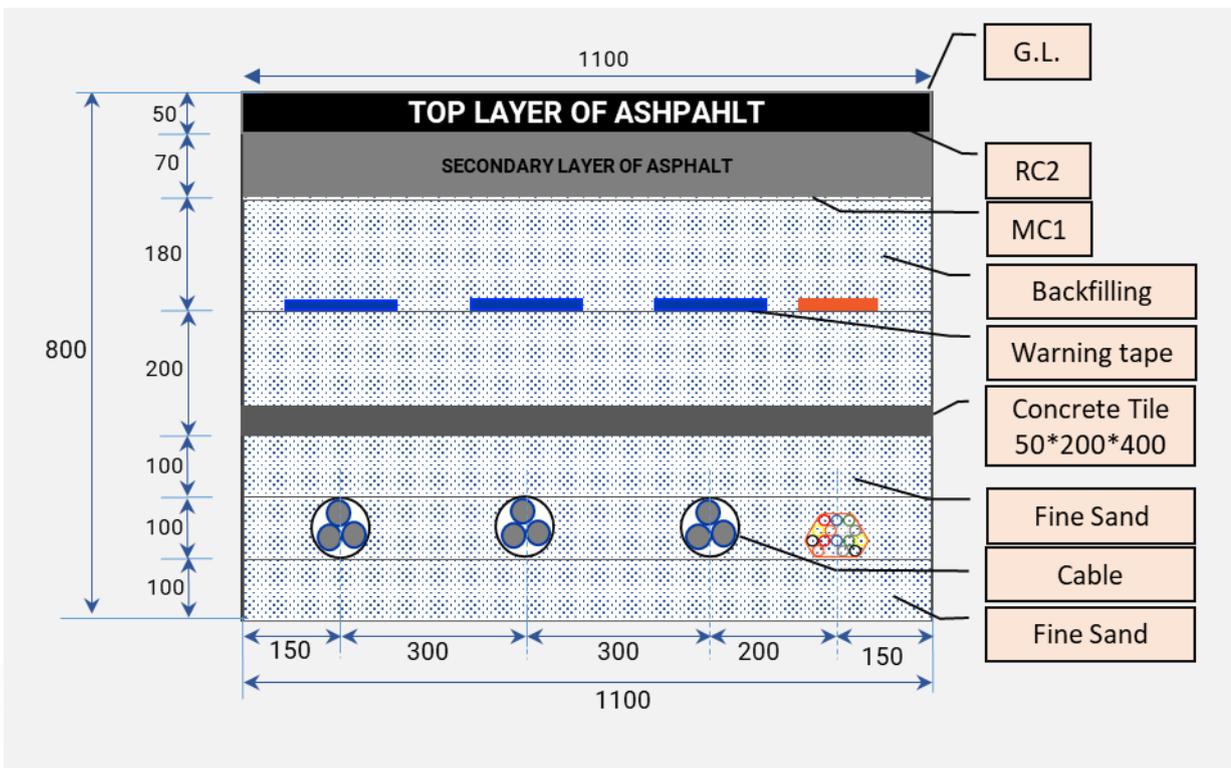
C: Normal Trench MV 3 Cables & 16-way Duct
